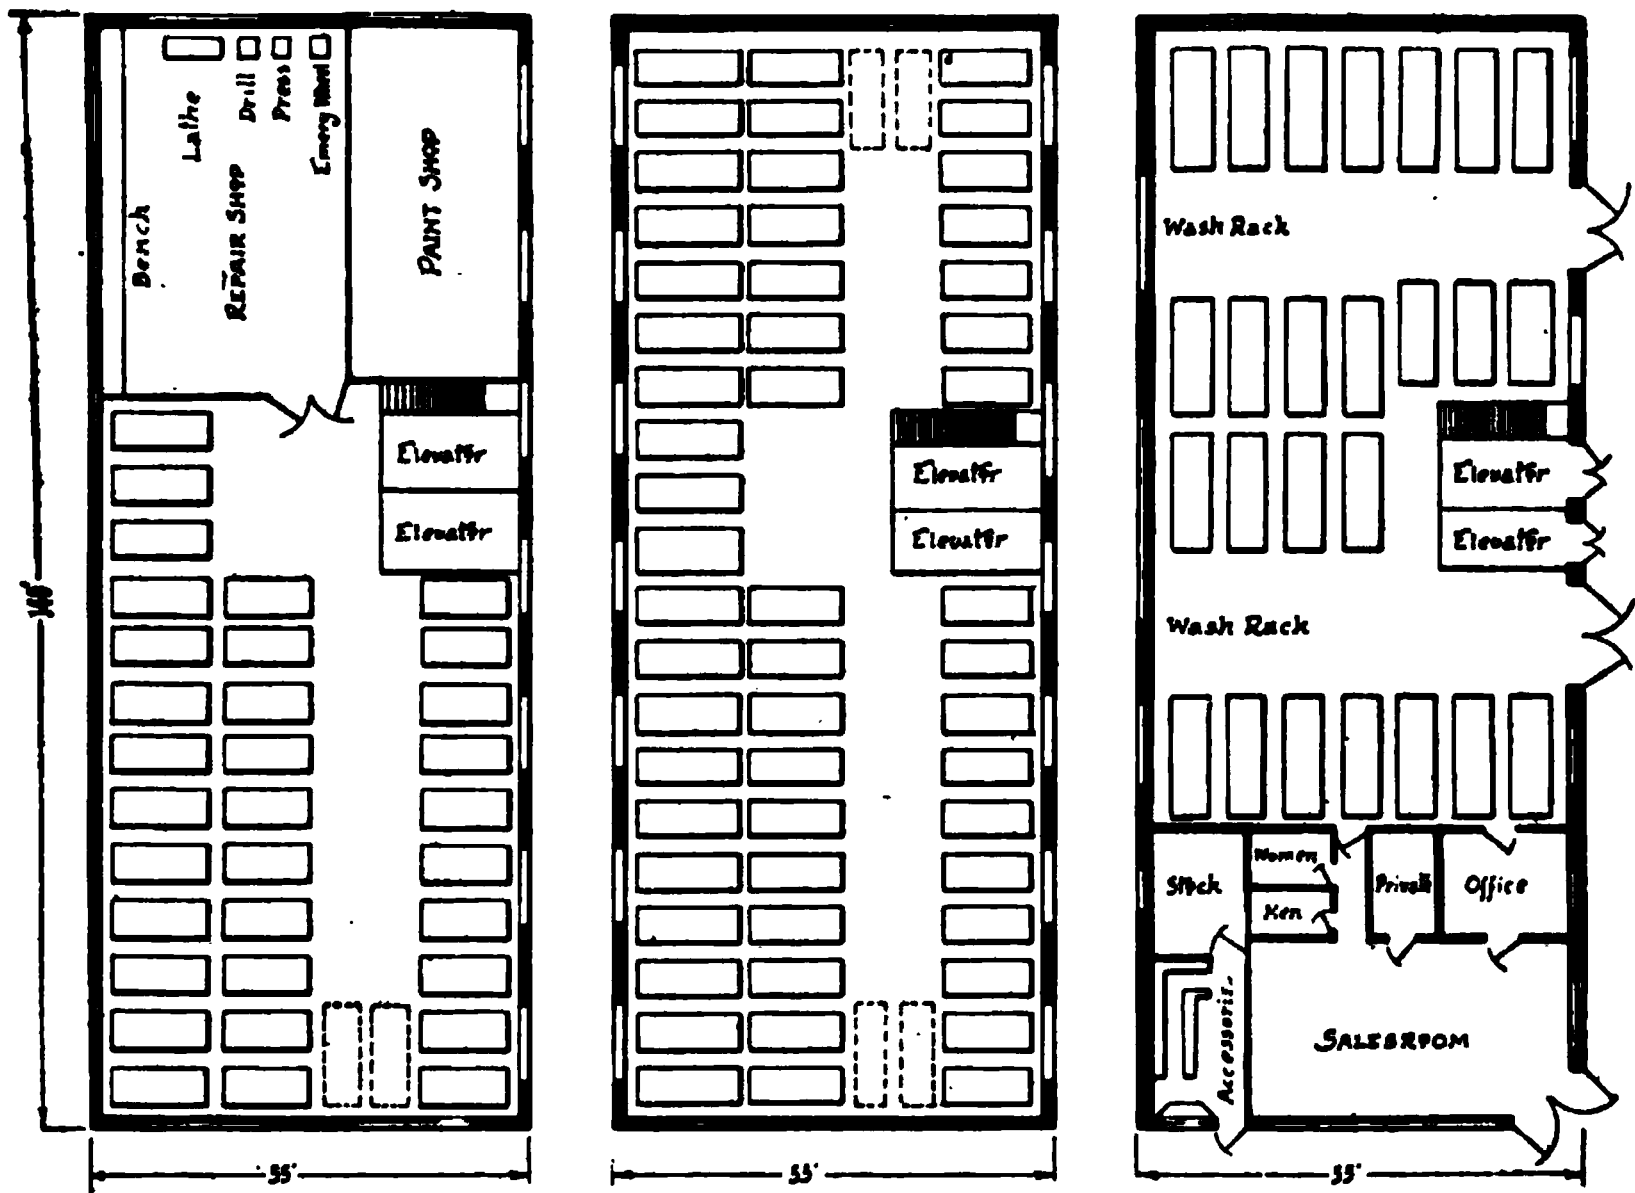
Arrangement of Three-Story Garage, in Which Two Elevators, Side by Side, Are Used
